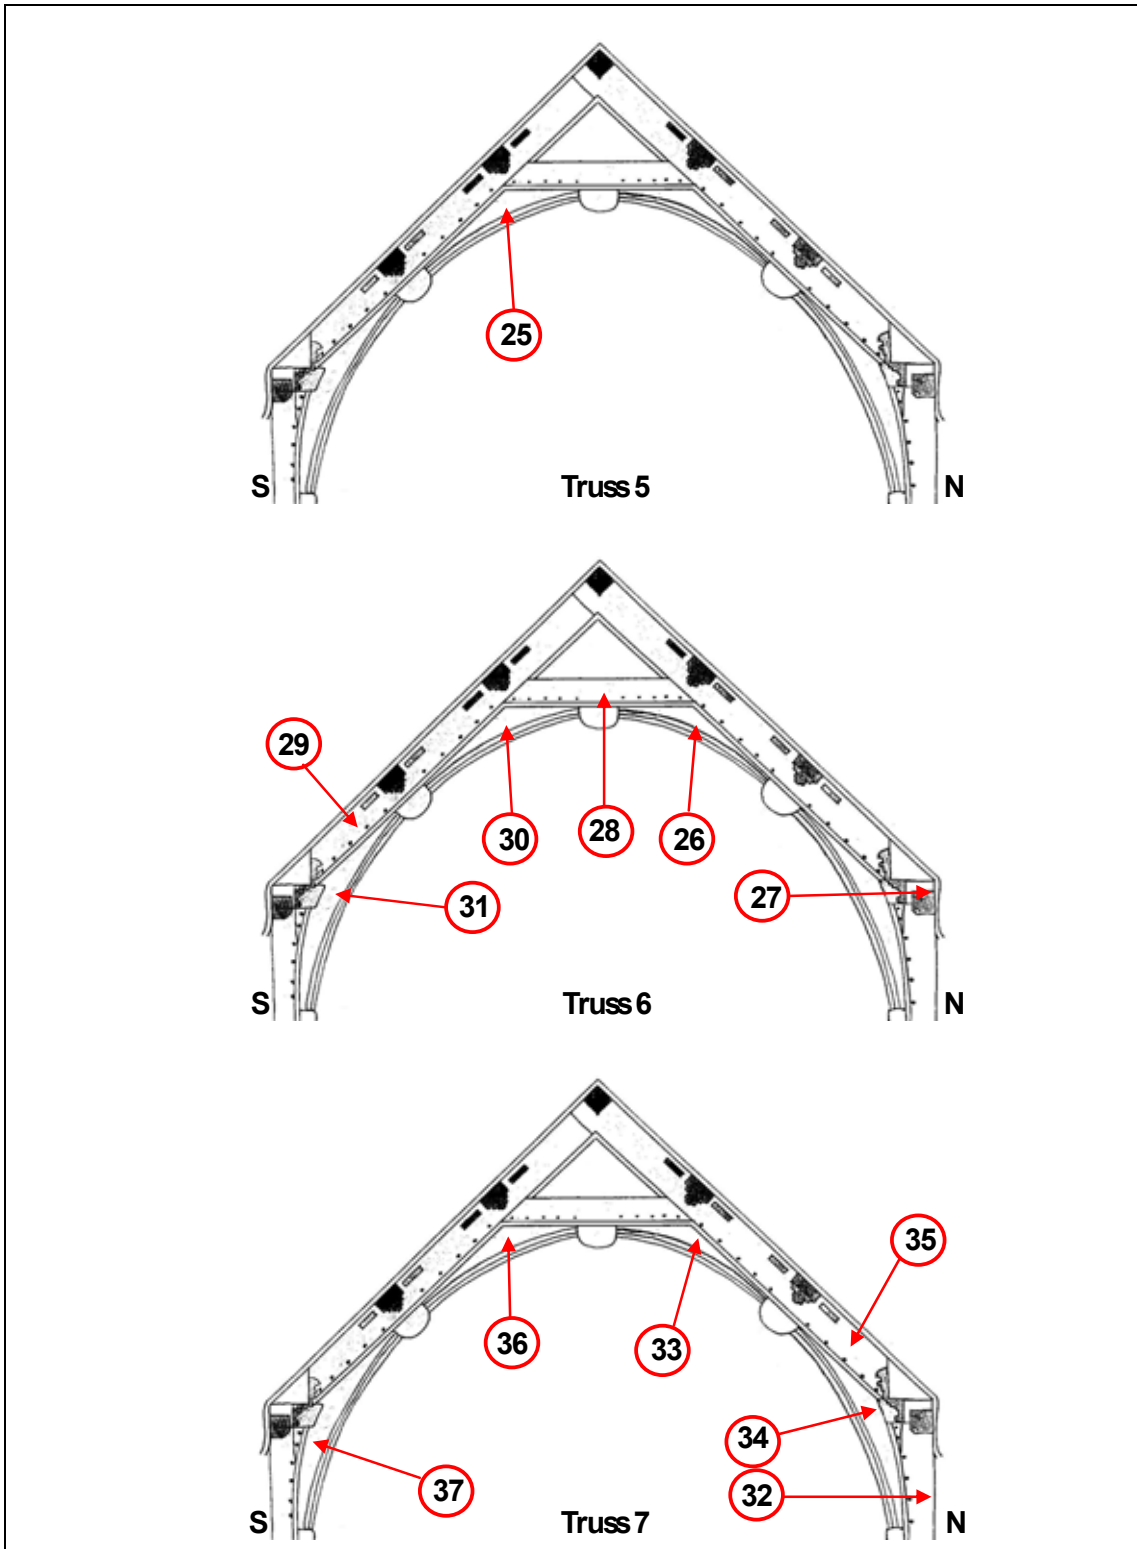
Eastern trusses 5–7 of the hall roof to show sampled timbers
